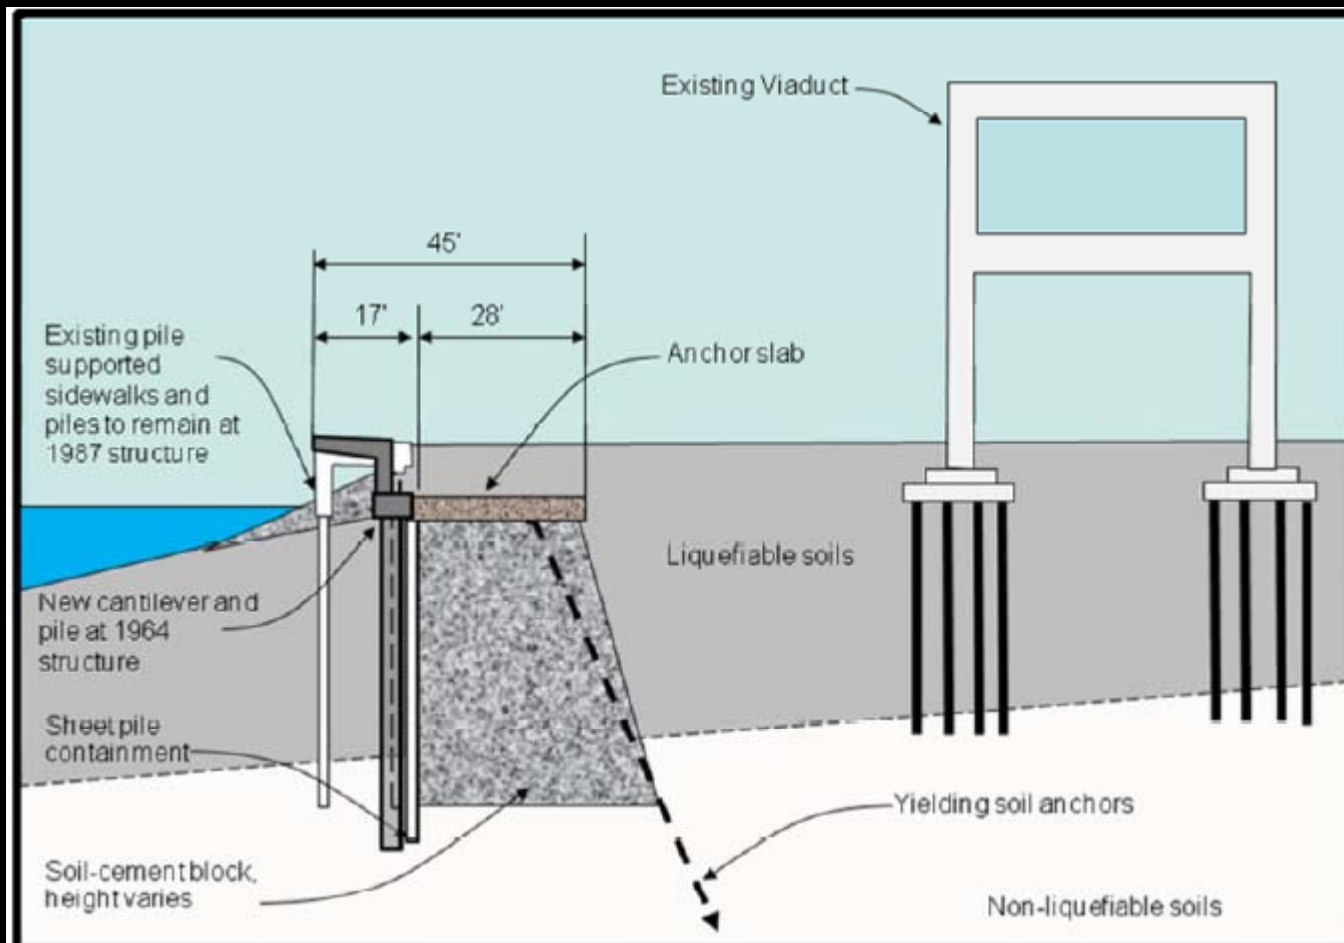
Proposed Anchored Soil Improvement Concept at Pile Supported Sidewalks
